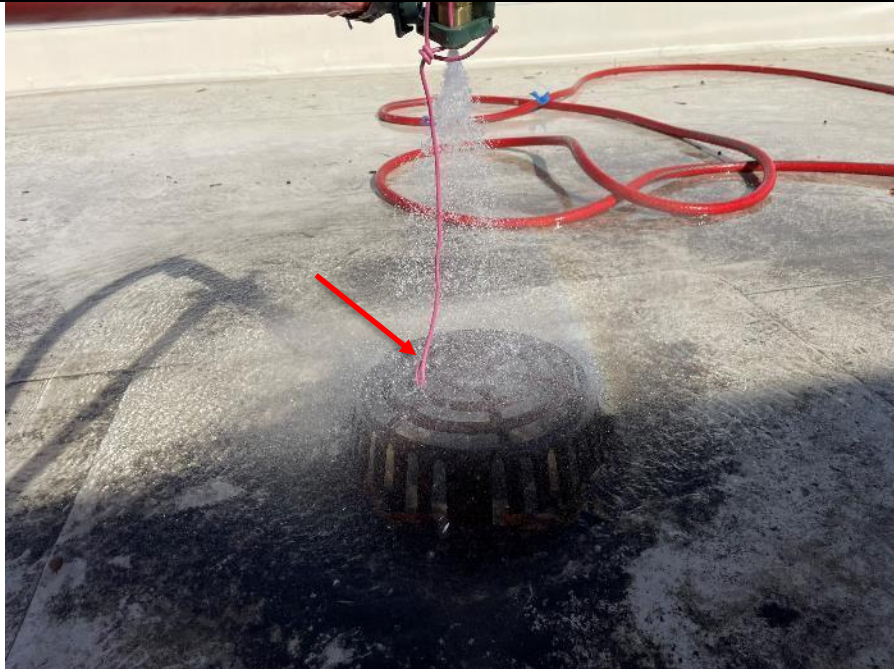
Test location #1 - water was applied along the roof penetrations including roof drain, deteriorated/missing sealant at roof penetrations (VTR) and building component transitions (coping cap to stucco cladding).
